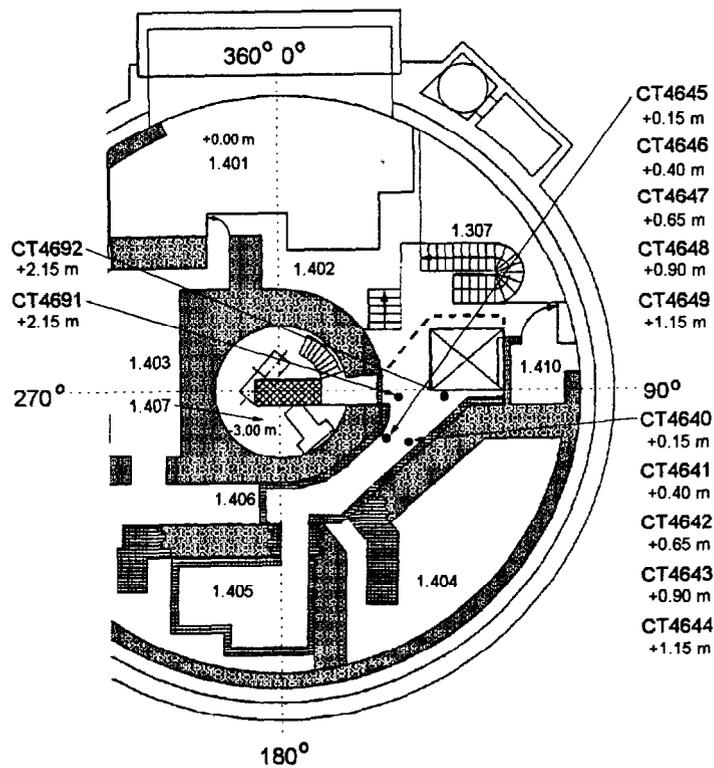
Fire Level Hatch TC's at the +0.0 m Elevation for T51.2
